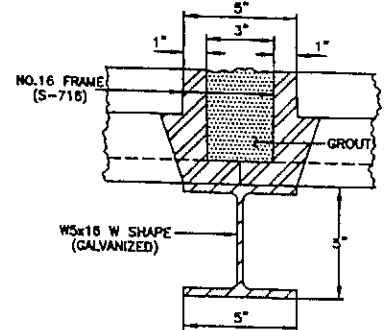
DETAIL CURB BOX ON SUPPORT RAIL (TYP.)
